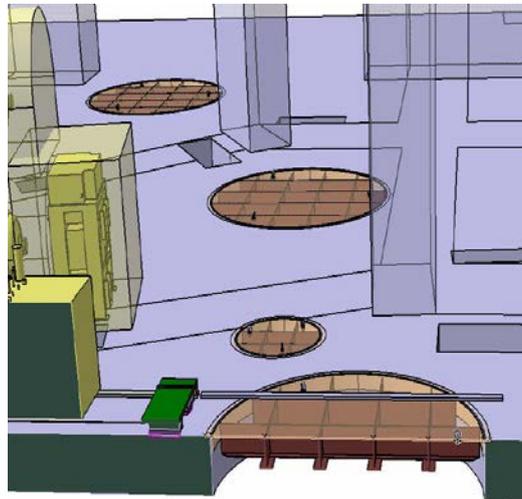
Illustration of a cover plate to protect an opening on the floor during installation
